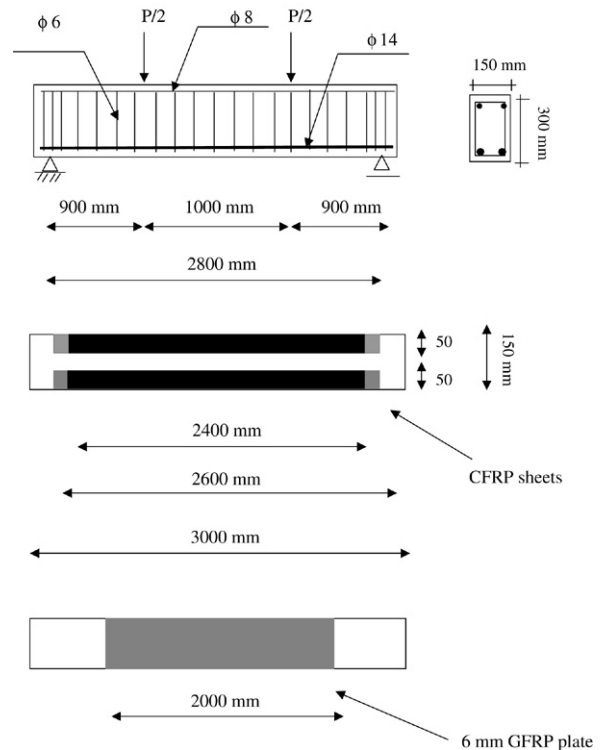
Details of RC beams and arrangement of different FRP reinforcements [10,33].
